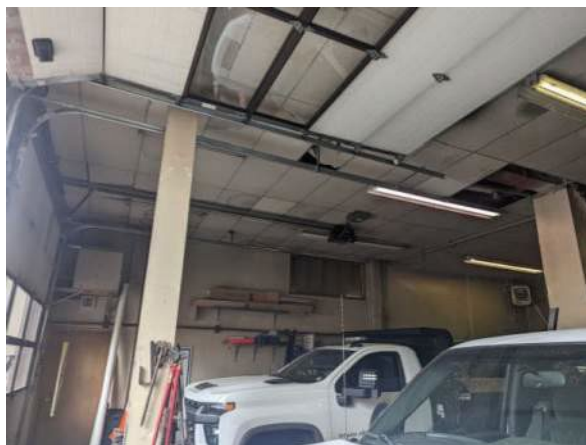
Evidence of previous water leaks in the lower Maintenance Building garage
